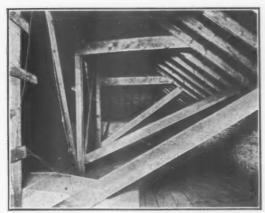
A TYPICAL ATTIC UNDER A PEAKED ROOF
